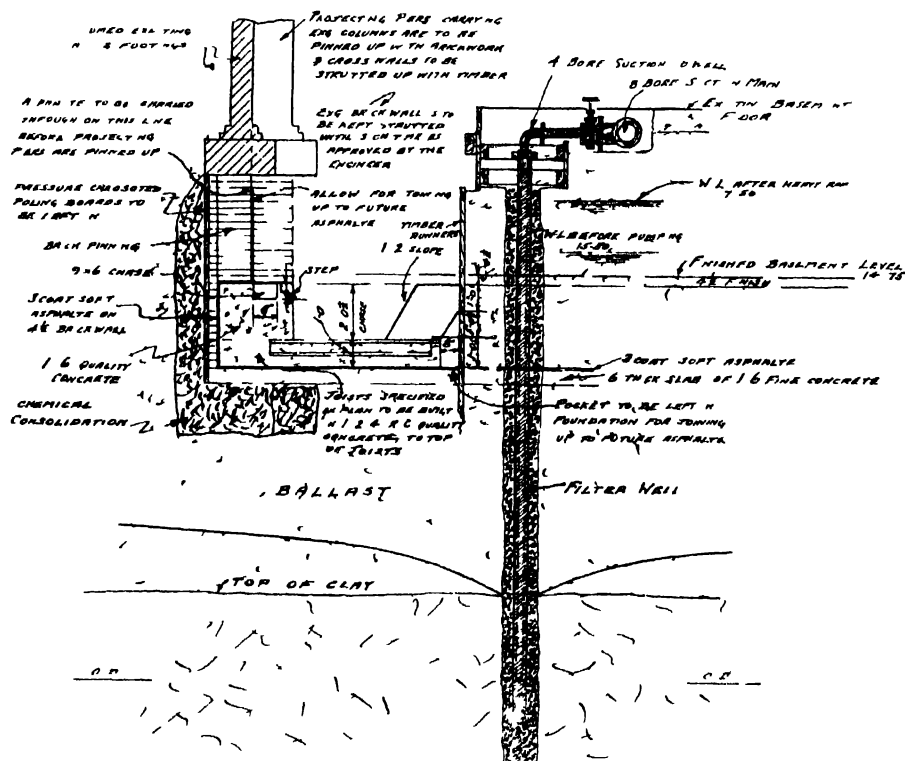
Typical section through underpinning of front walls, which also incorporate future stanchion foundations, also showing consolidation under pier and filter well
